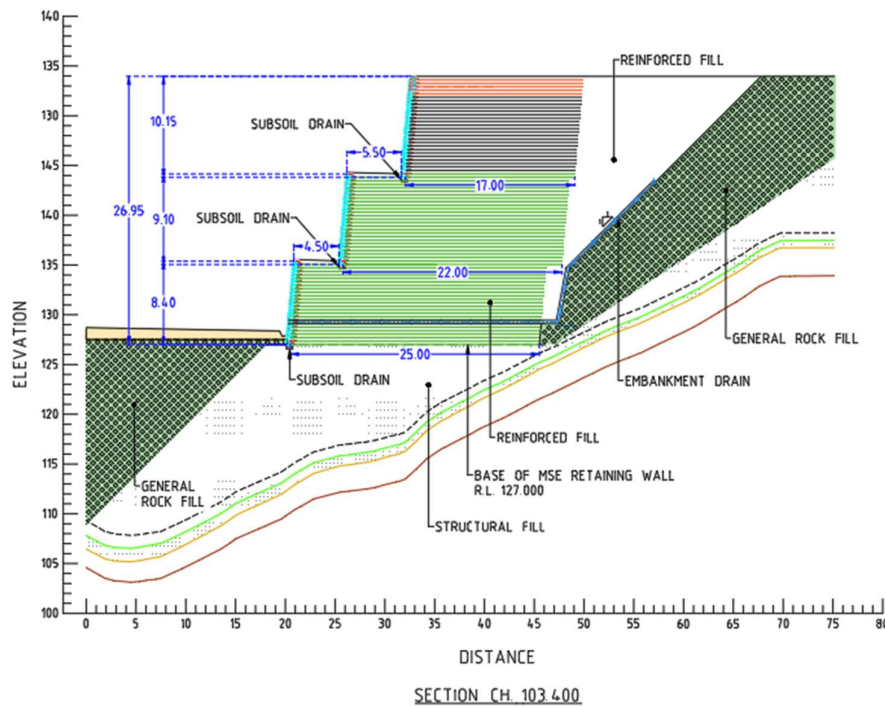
Cross-section of SierraScape Retaining Wall System (Section CH 103.400)
